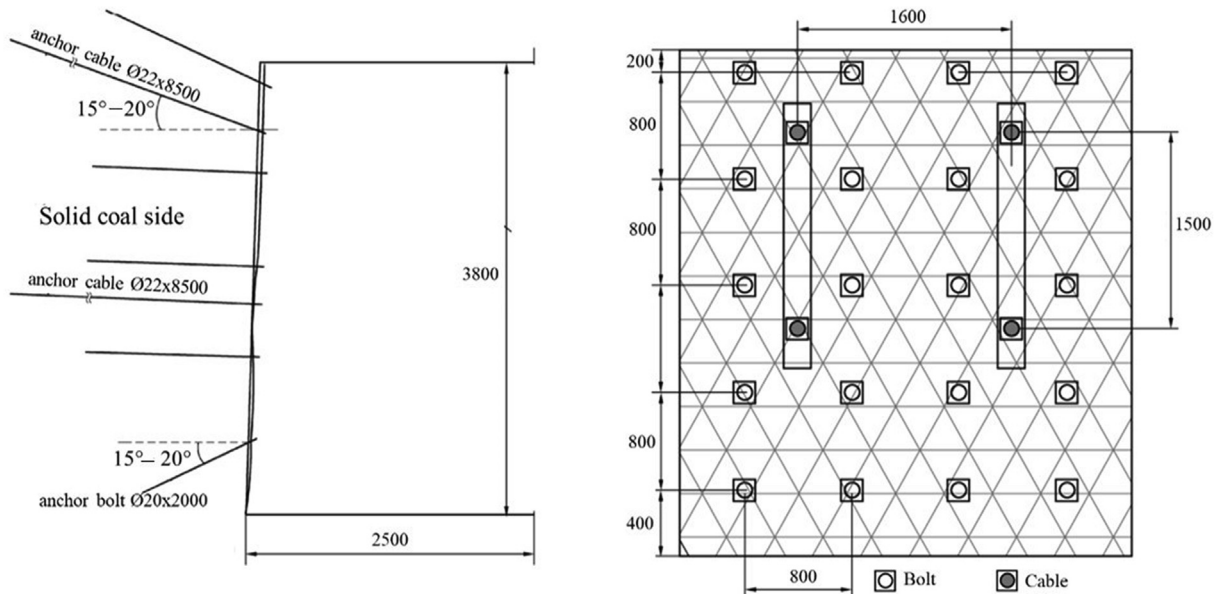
Case 2 – Solid Coal Rib Support Plan (Meng, 2020)(Unit: mm).
